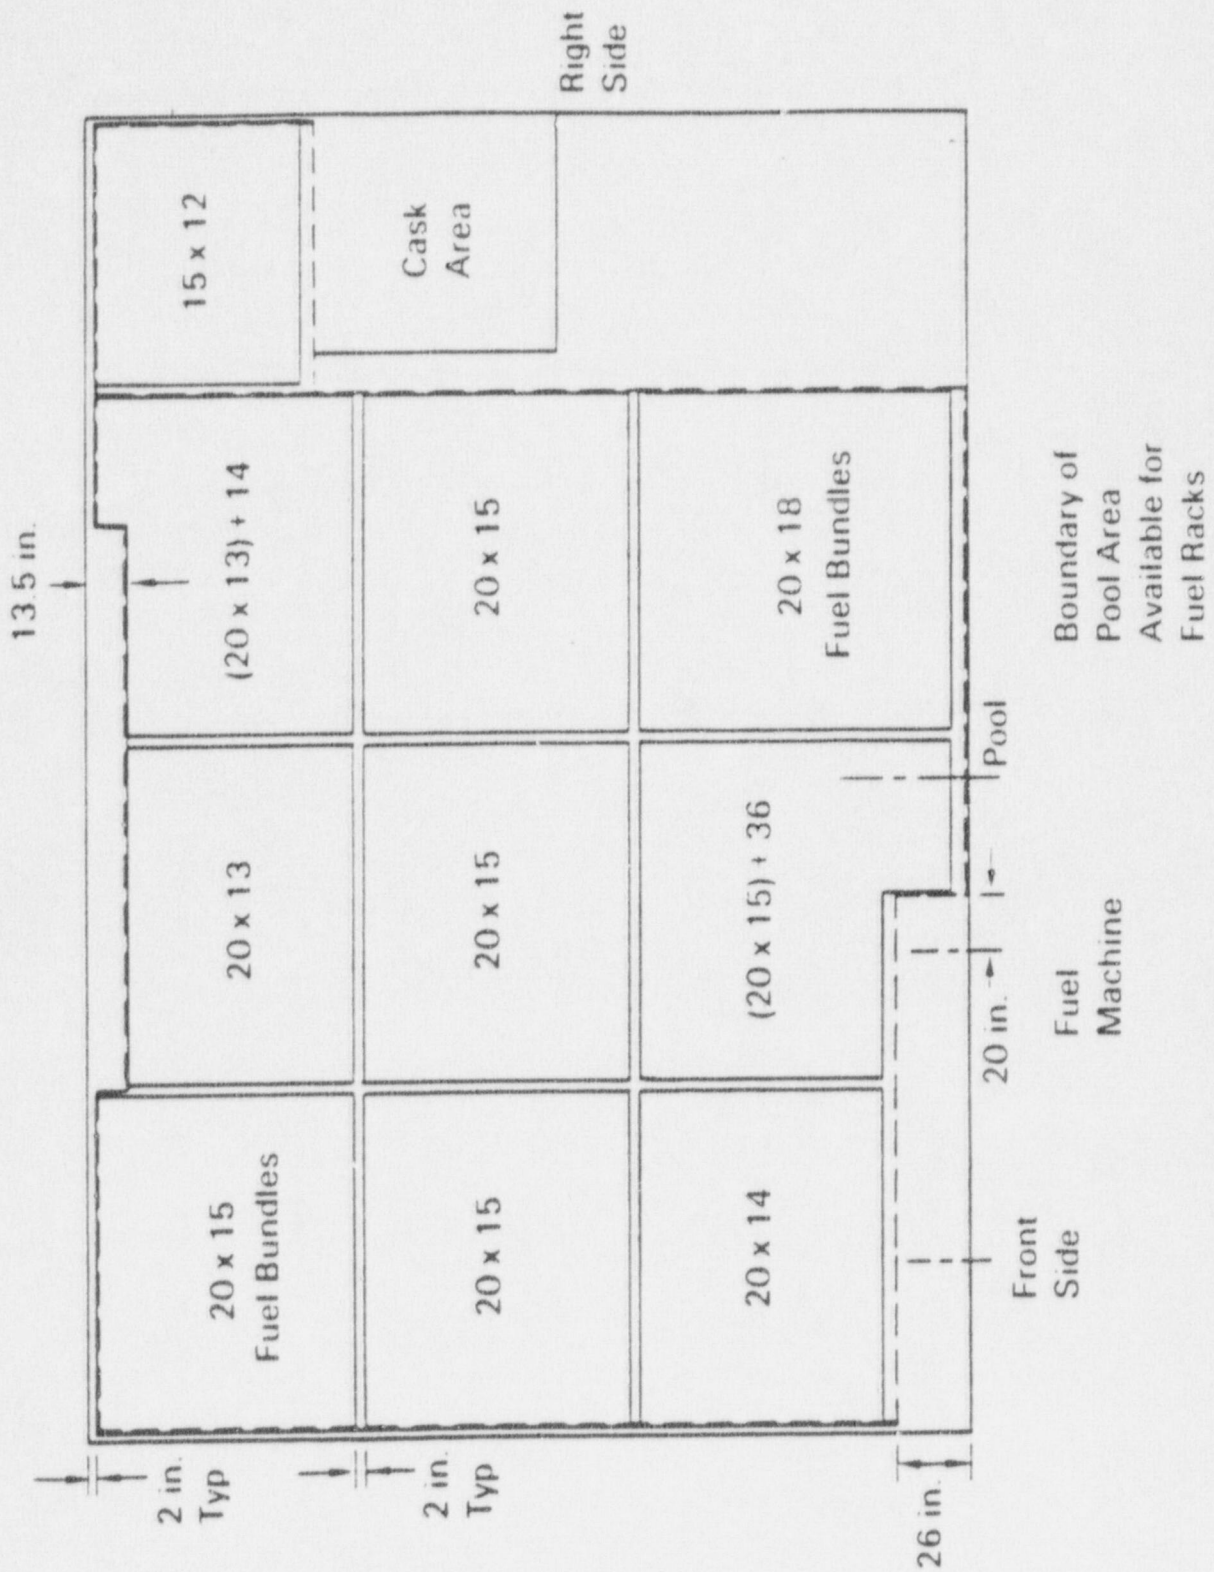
Cross Section of Vermont Yankee Spent-Fuel Pool Showing Proposed Storage Rack Layout
